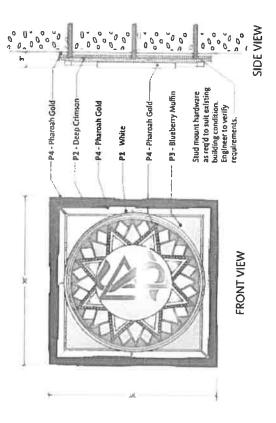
DETAIL VIEW - PROPOSED REPLACEMENT ROOF-TOP SIGN
